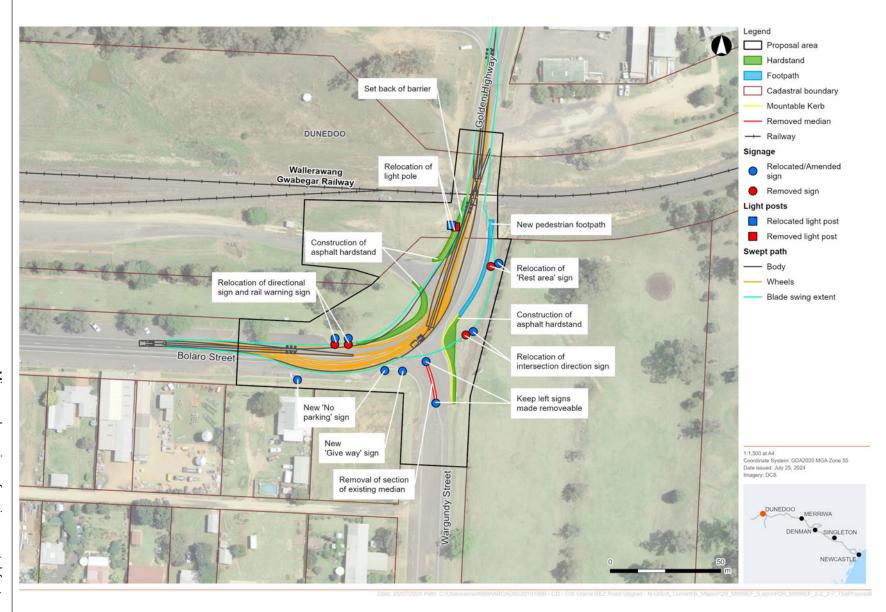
The proposal - Golden Highway and Bolaro Street intersection (H-023), Dunedoo (Figure 1 of 2)
